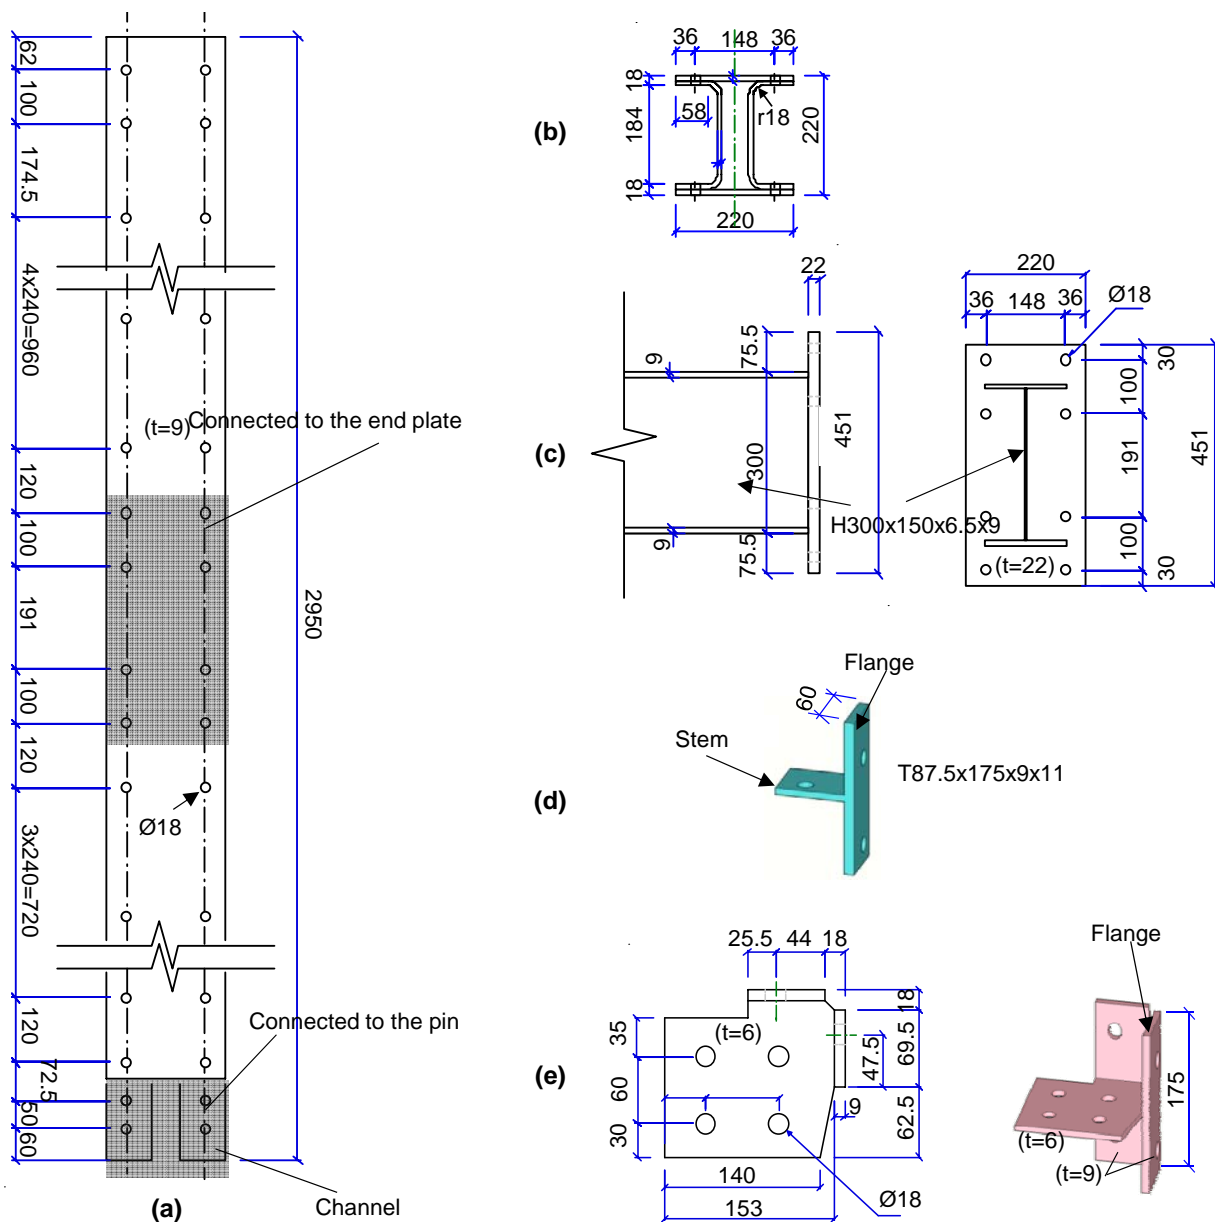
Dimensions of specimens: (a) elevation view of the column; (b) cross section of the column; (c) beam with end plate; (d) Tee stiffener; (e) angle stiffener.
